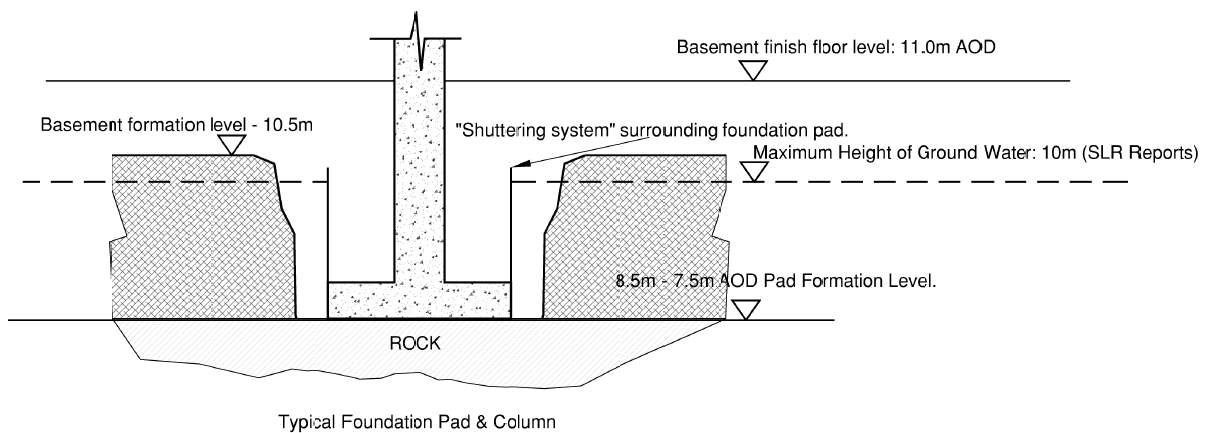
Construction Management Plan - Typical Foundation Pad & Column
